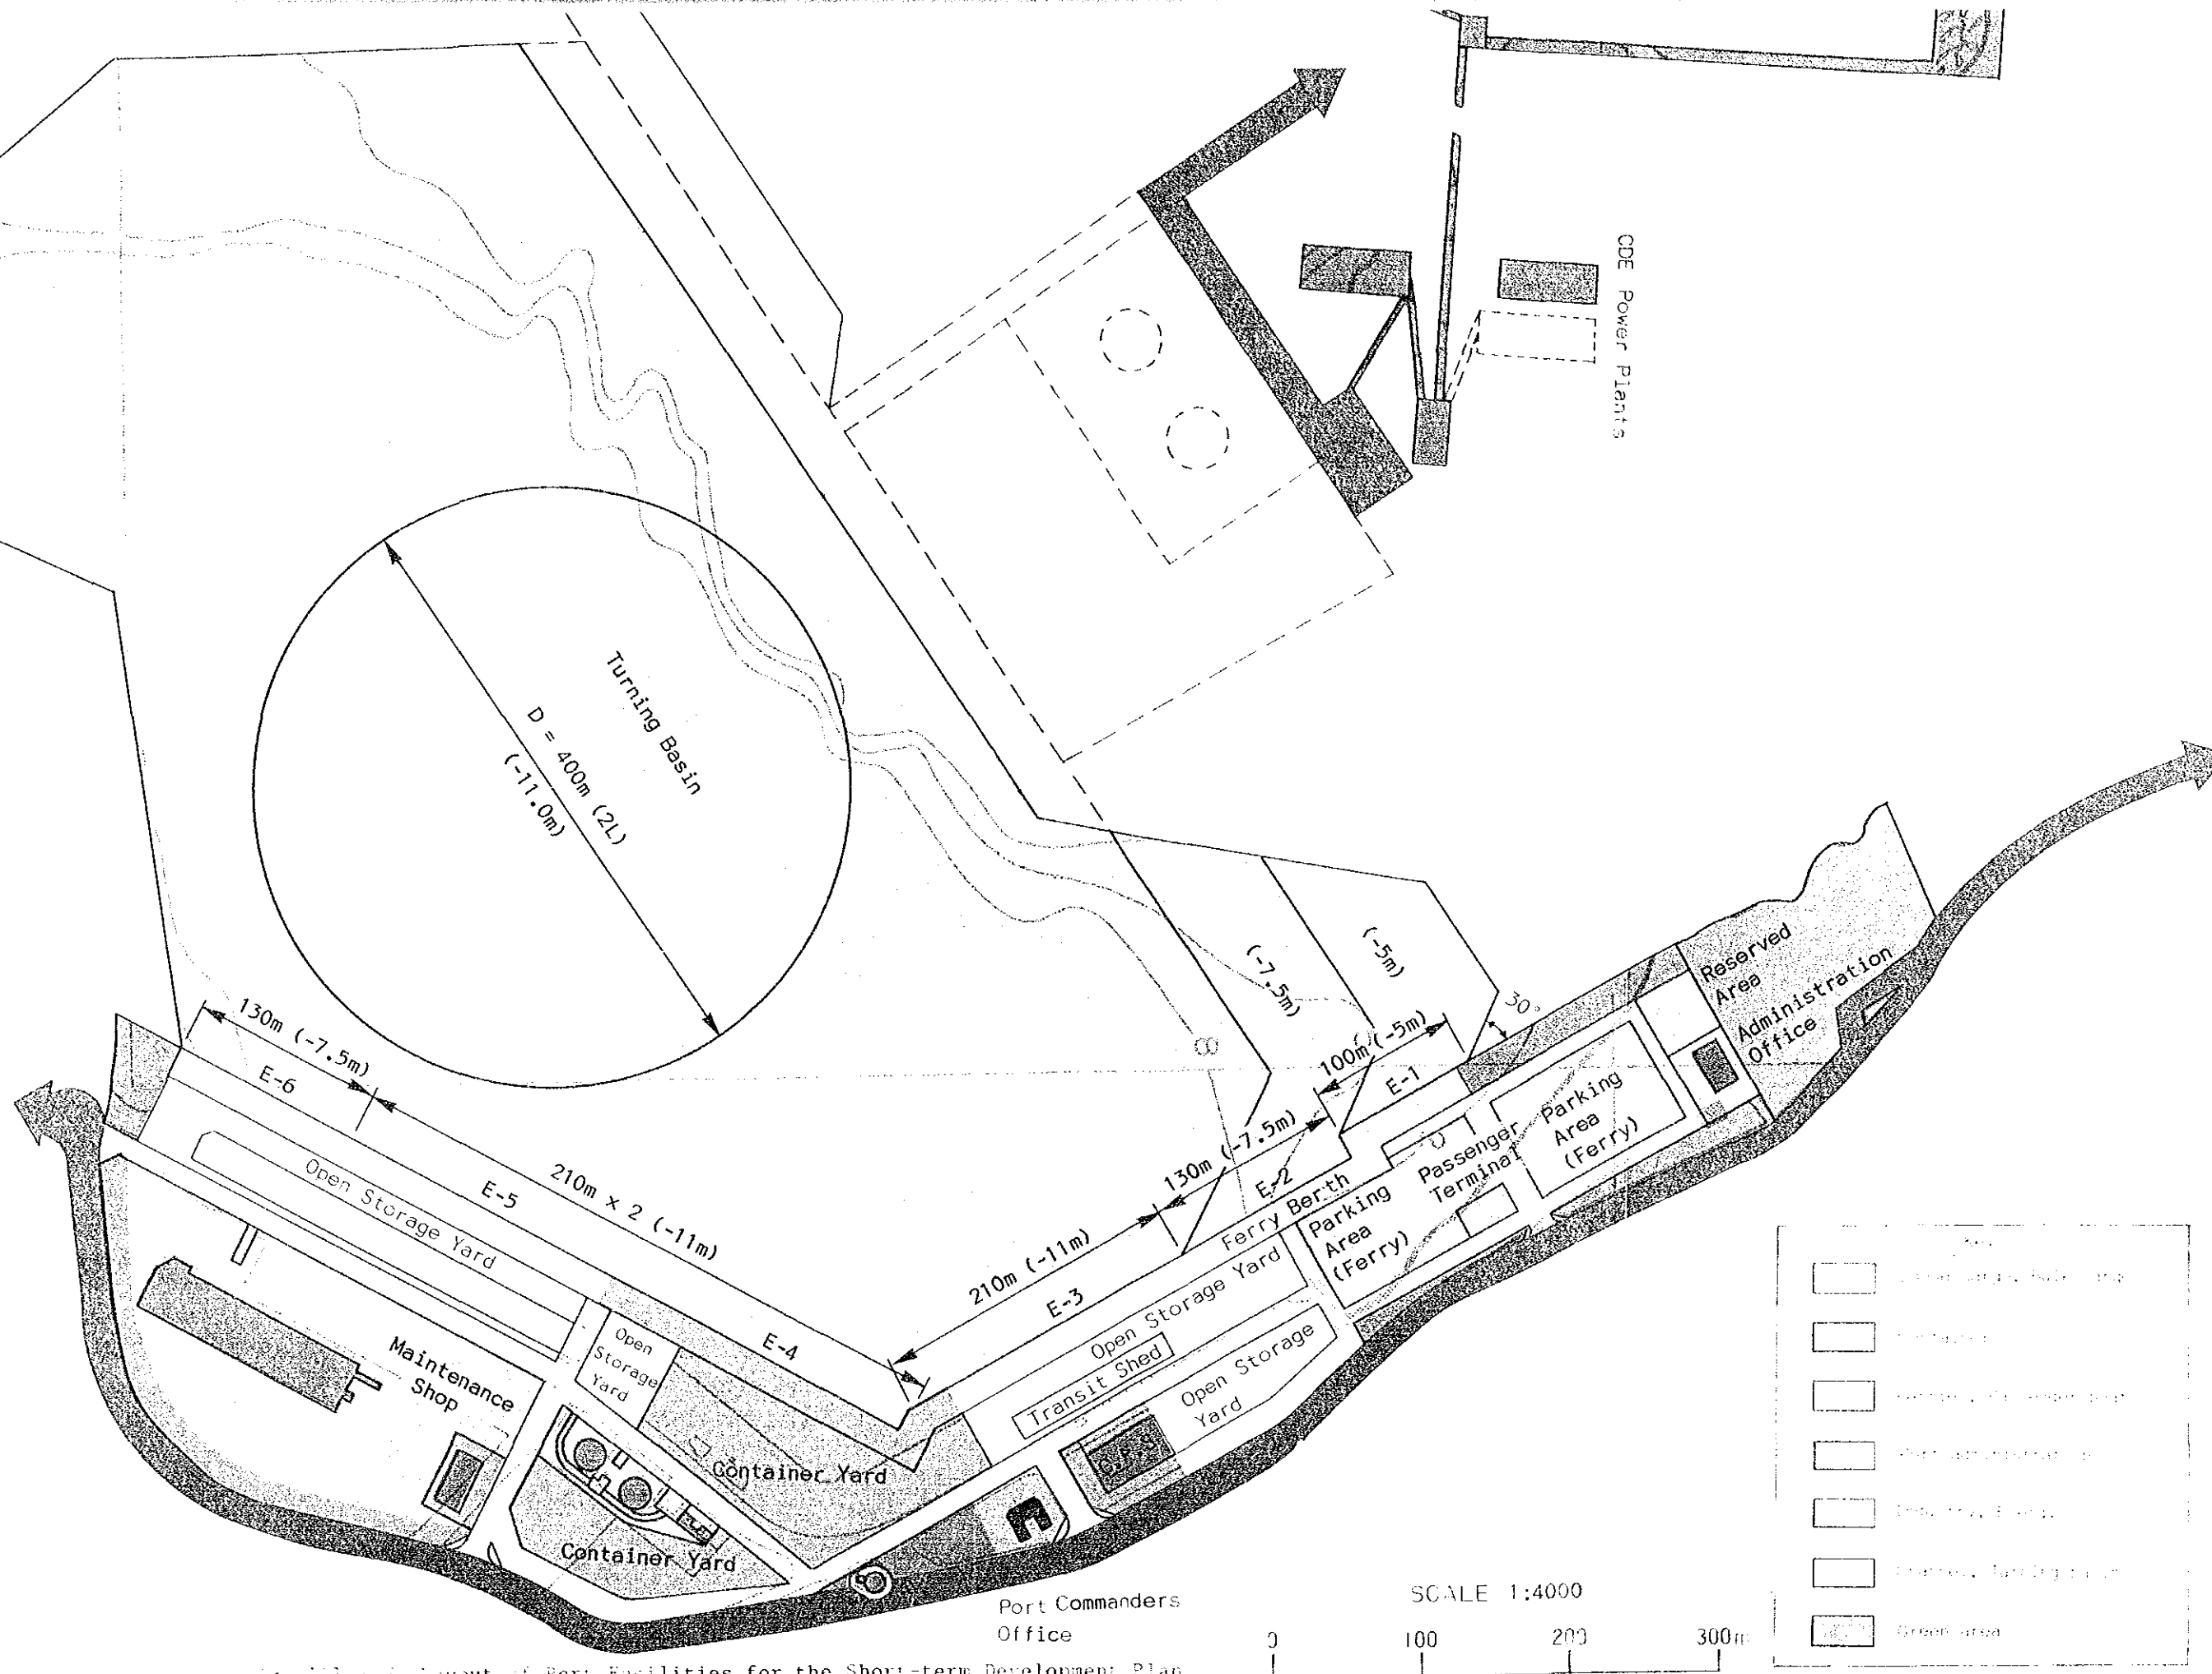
Layout of Port Facilities for the Short-term Development Plan
